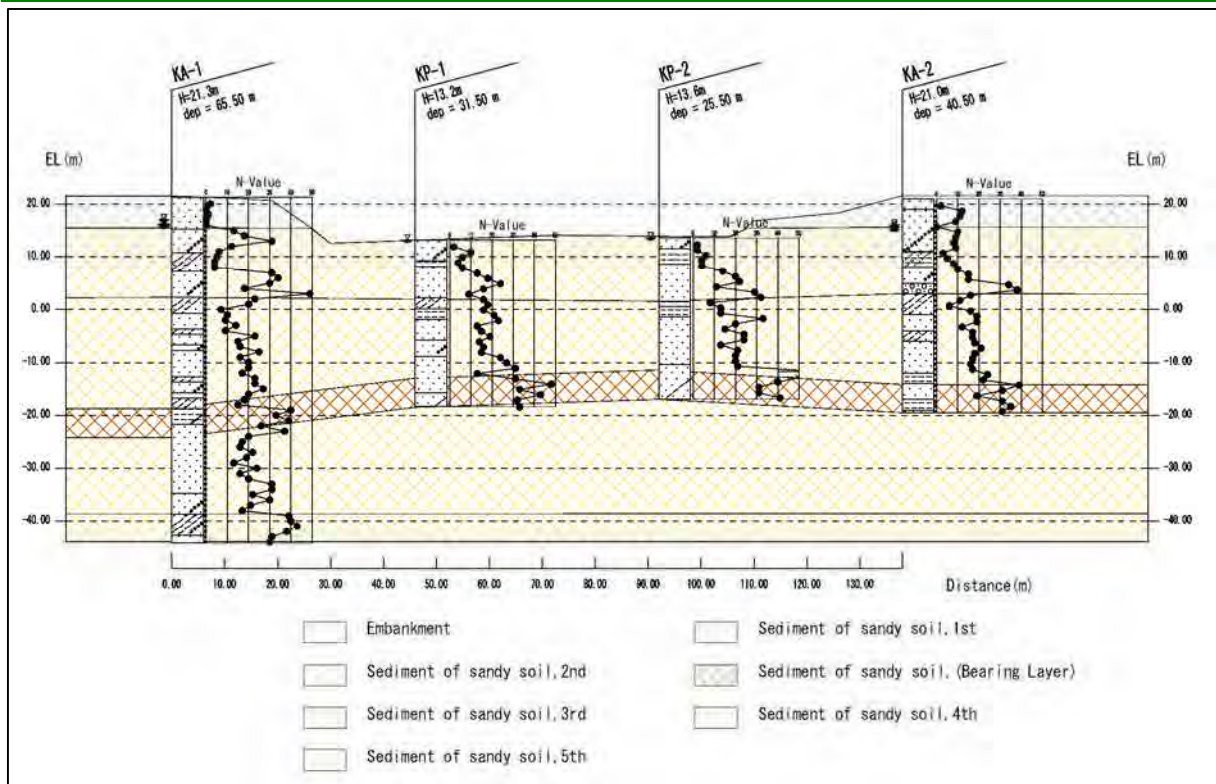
Projected Strata Cross Section - Kapiura Bridge
